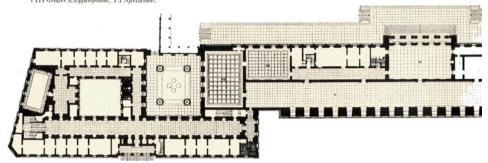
Building Floor Plan of the New Reich Chancellery in Berlin
